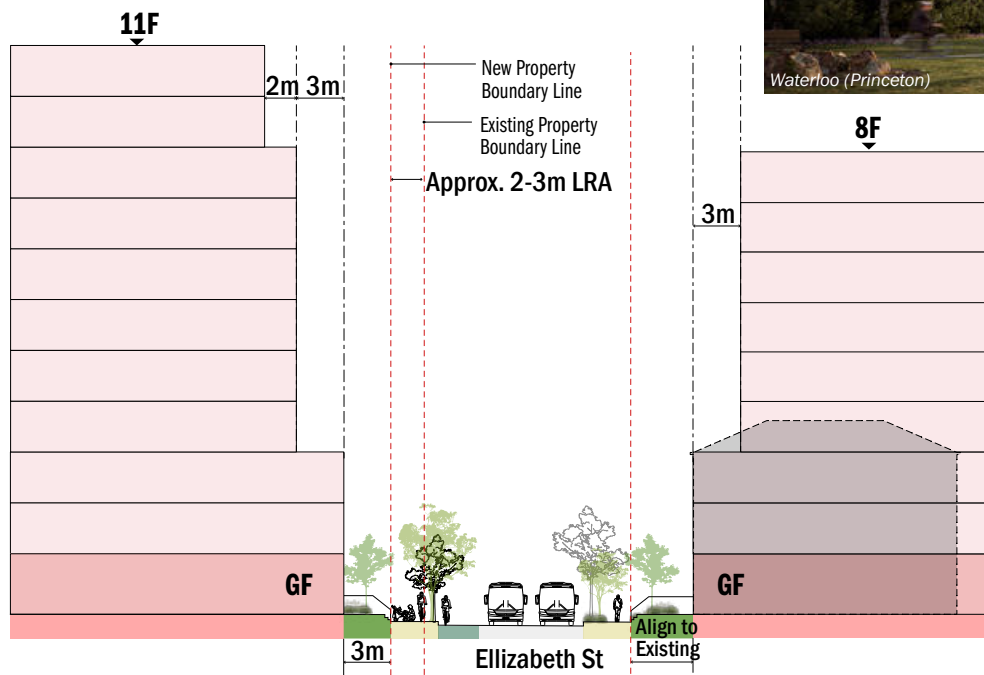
Section 1 - Elizabeth Street west of Grainger Avenue including Land Reservation for Acquisition (LRA)
